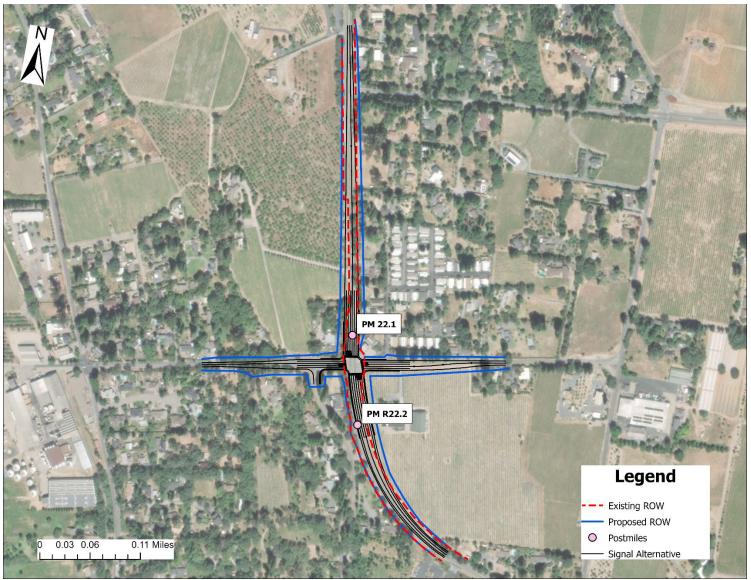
Overview of Alt 1. SR 116 runs north to south, while Green Valley Road runs east to west.
